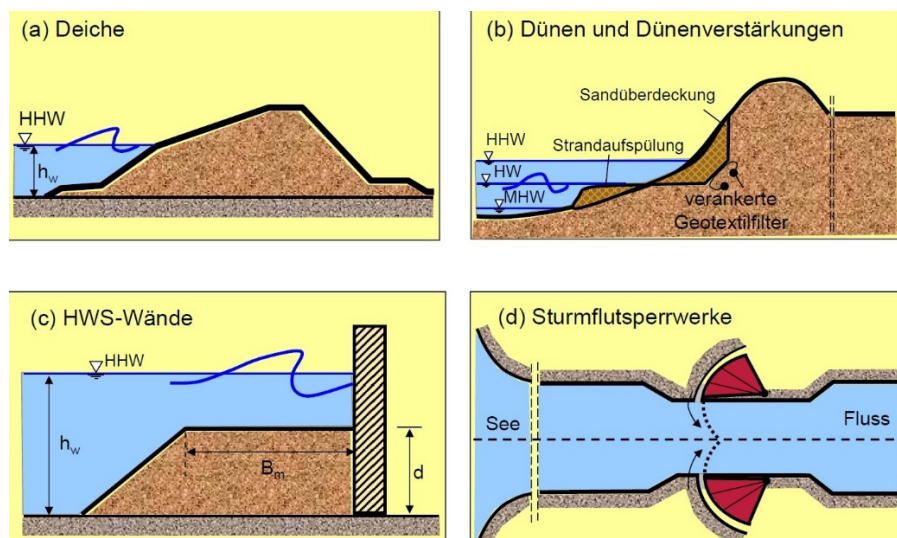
Flood protection works in the German Coastal Zone (Overview), a) Dikes b) Dunes and Dune Reinforcements c) Flood Protection Walls d) Storm Surge Barriers. (Source: H. Oumeraci, “Coastal Engineering” Lecture Notes, TU-BS)
